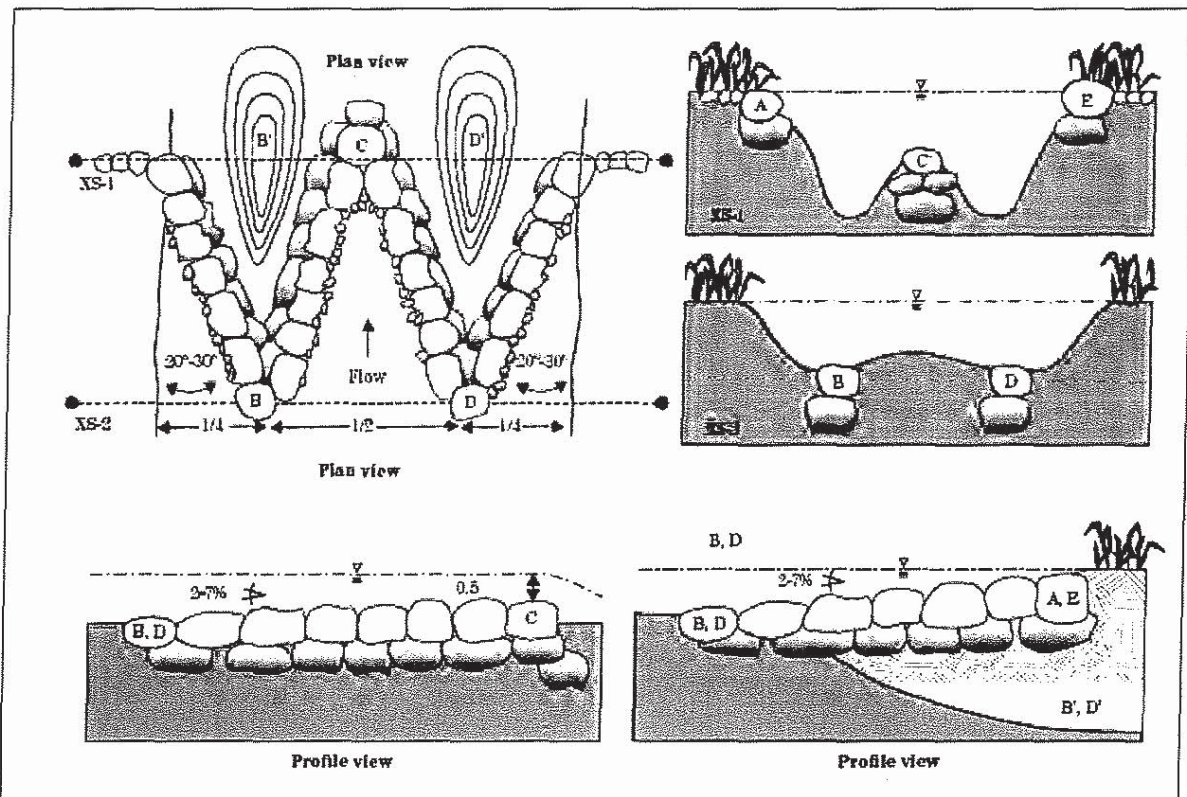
Plan, cross-section and profile views of a W-weir structure (NRCS, 2007).
